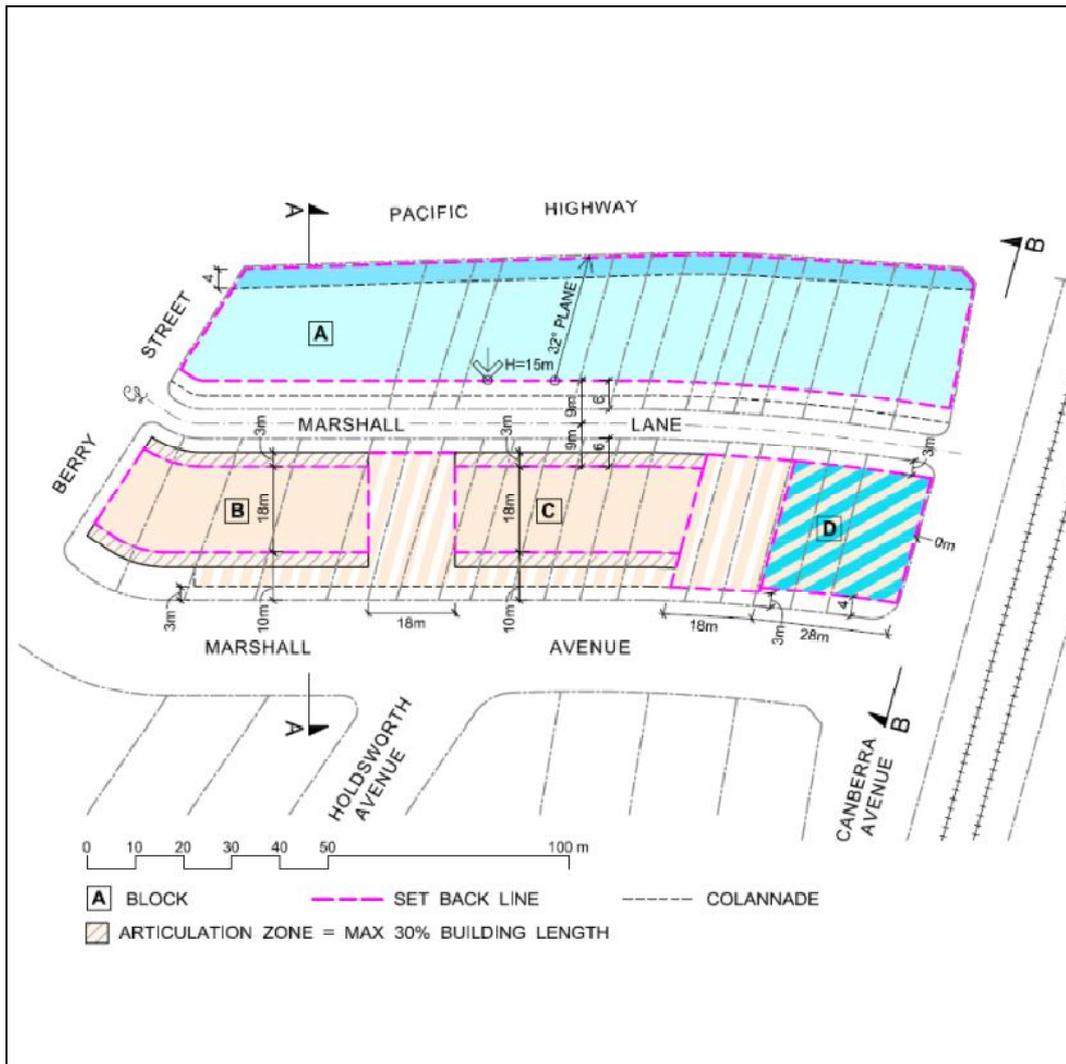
Block Layout Plan. (Source: Lane Cove DCP).
